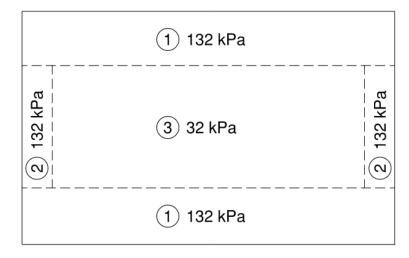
Loading Requirements Shown in Plan View of Counterweight (Loading includes Dead Load, Live Load and Concrete Pressure)
